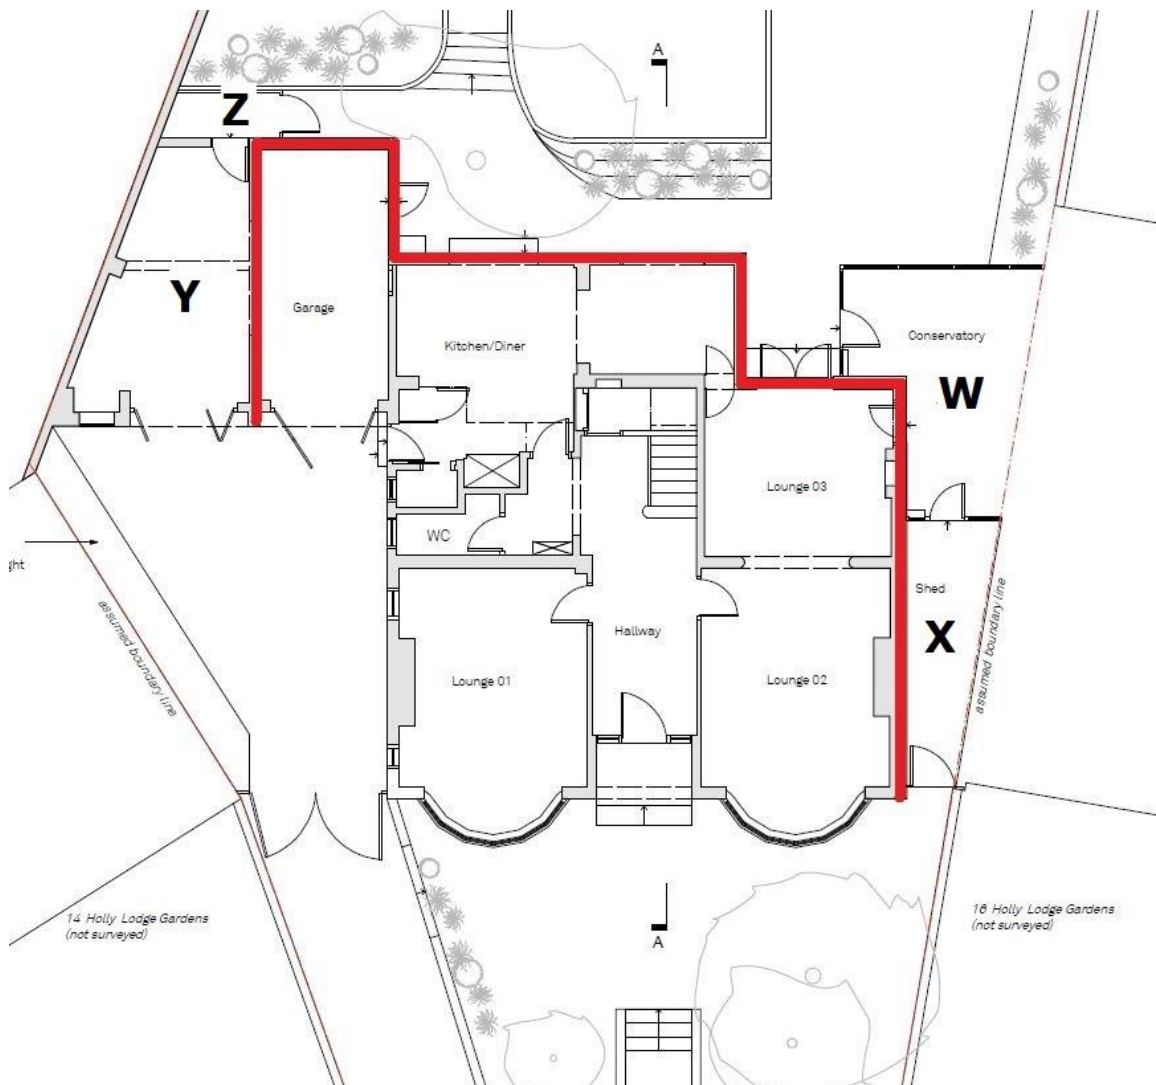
Current ground floor plan with the rear and side walls of the original dwelling highlighted in red.
